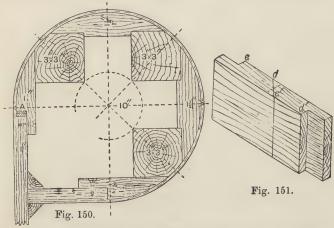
Three-quarter Turn Step. Fig. 151.—Setting out Cheek-pieces.
